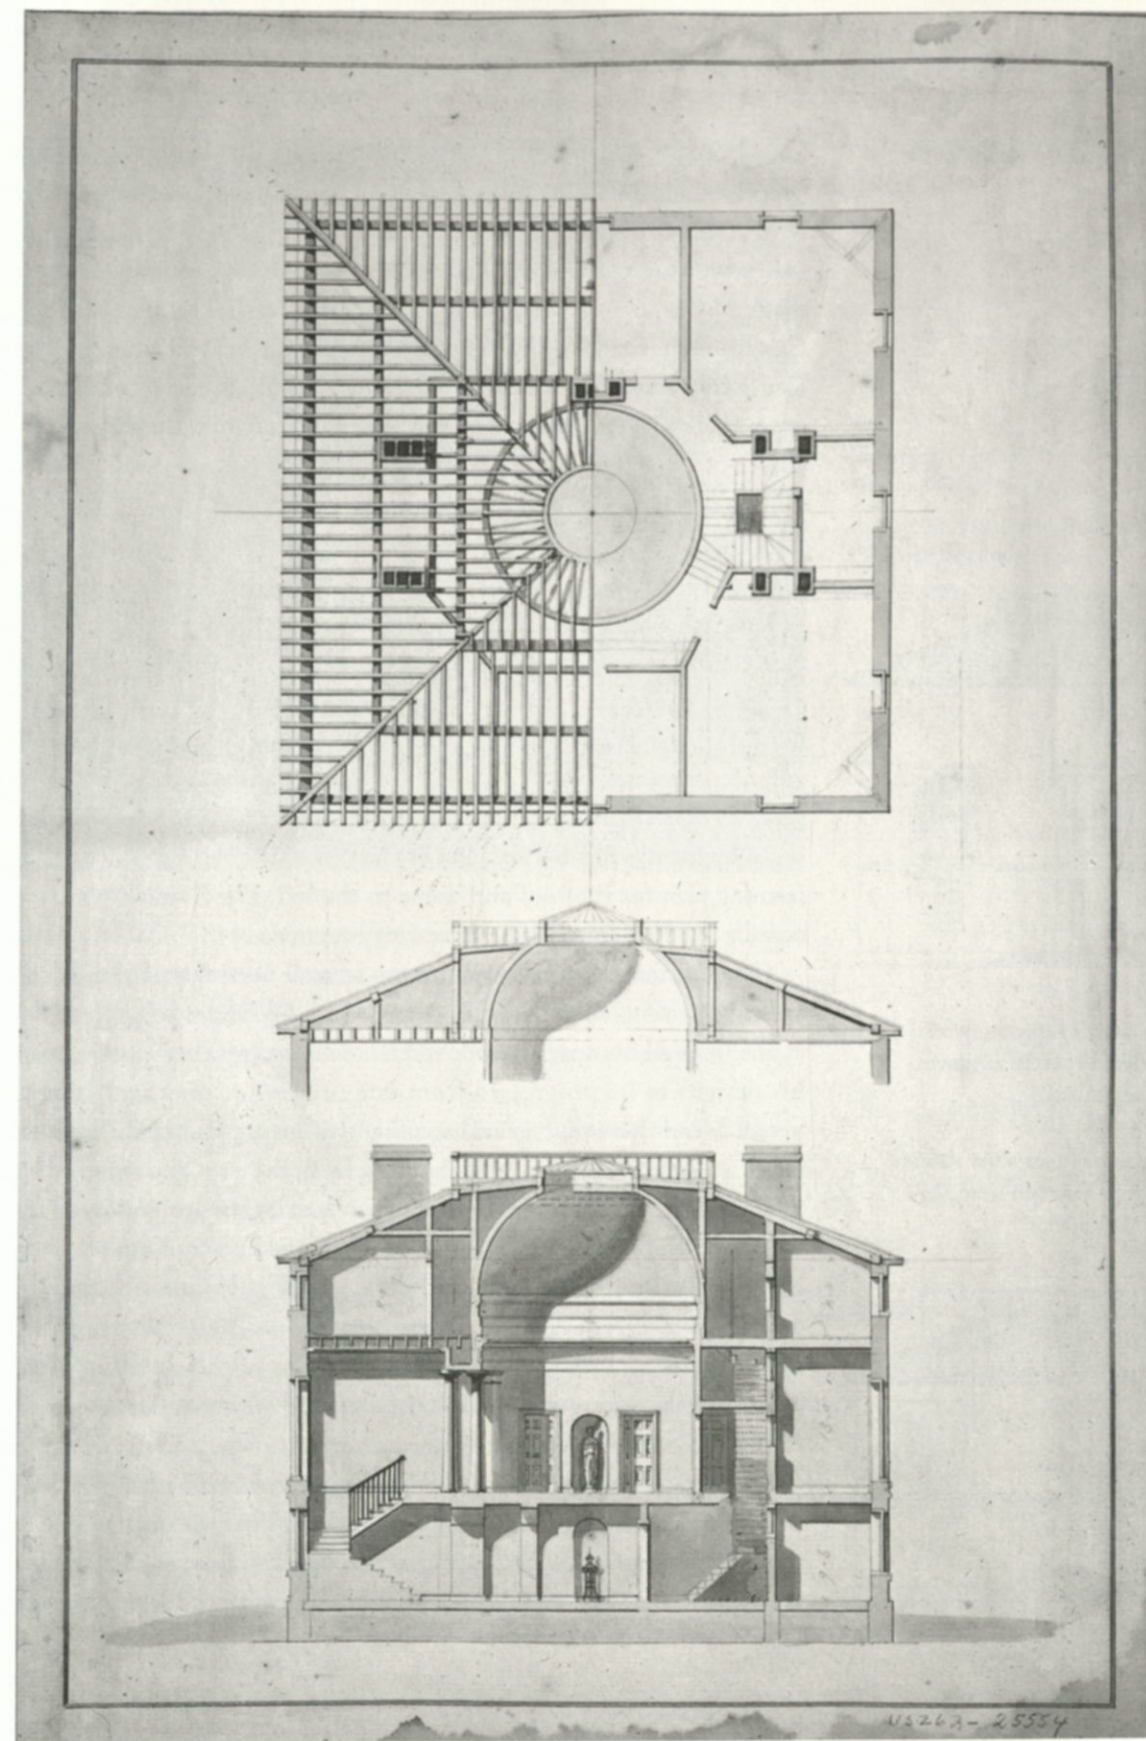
Latrobe sections and attic / roof-framing plan of Pope Villa, undated, but ca. 1811. (Library of Congress, Division of Prints and Photographs)
